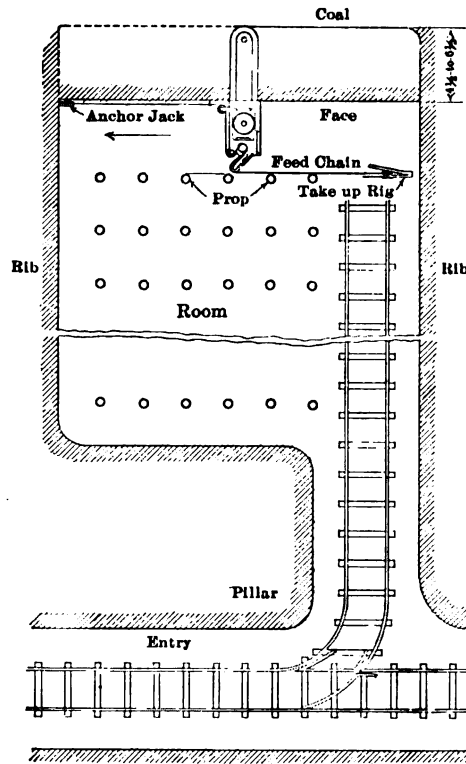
Room and pillar mining with continuous coal cutter. (Sullivan Machinery Co.)
